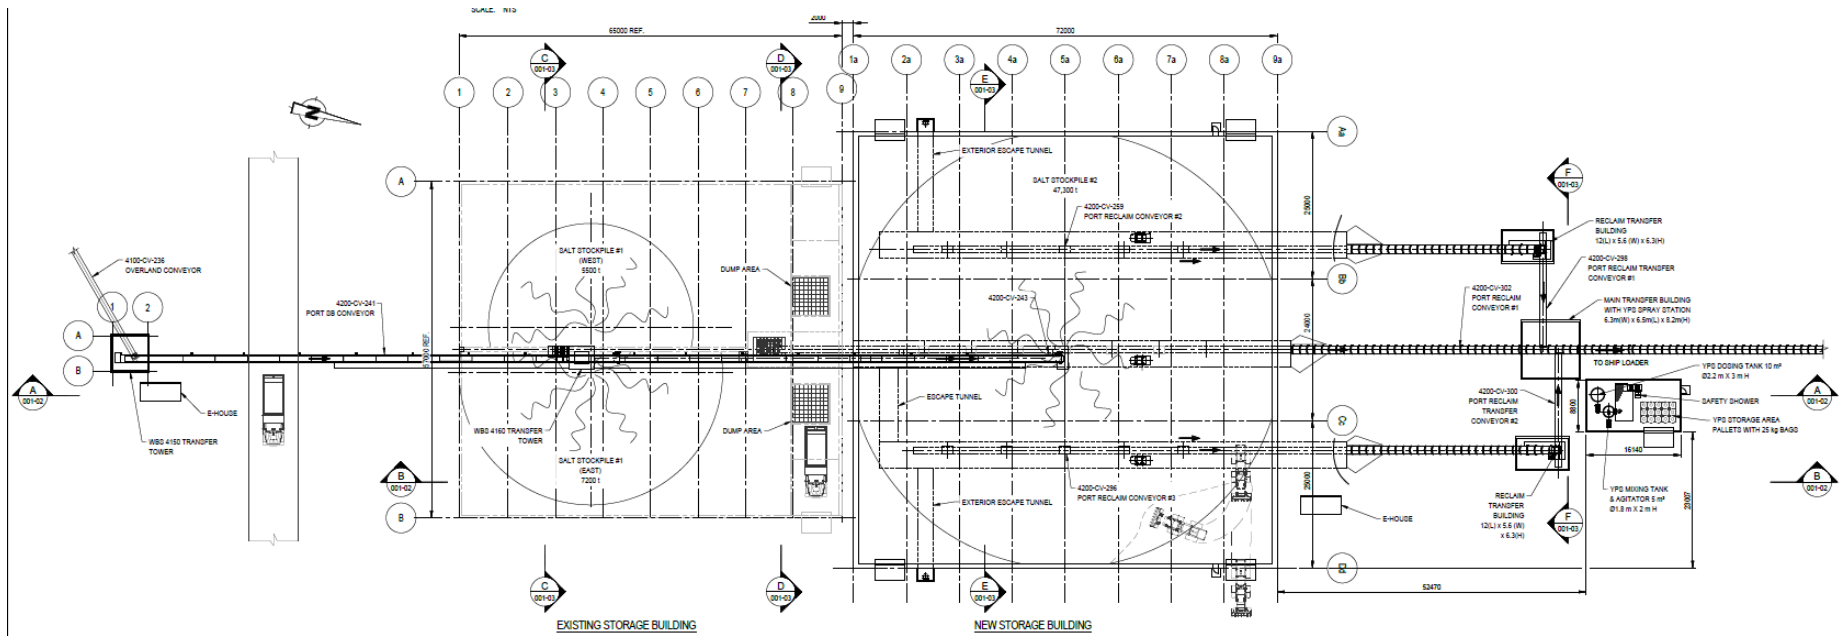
Proposed Storage and Loading Modification – Plan View
